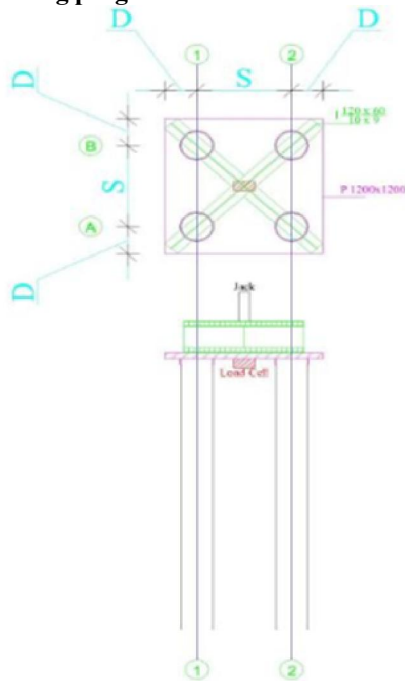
Four piled-raft foundation model with pile cap subjected to axial load
